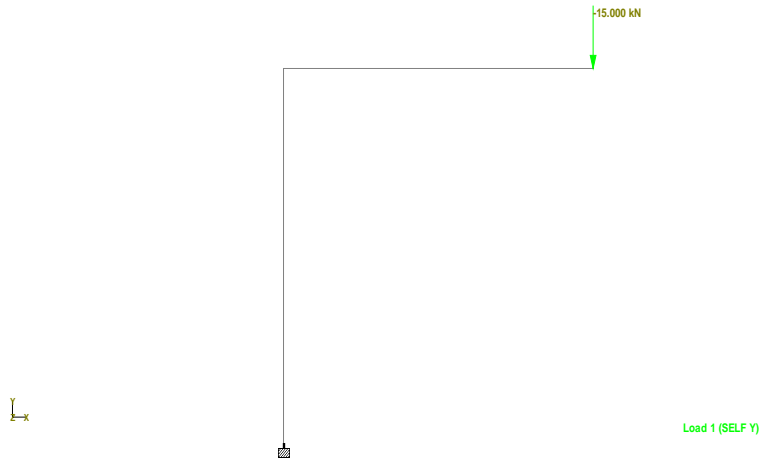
Specimen –A beam column joints for closed joints (In Staad)
